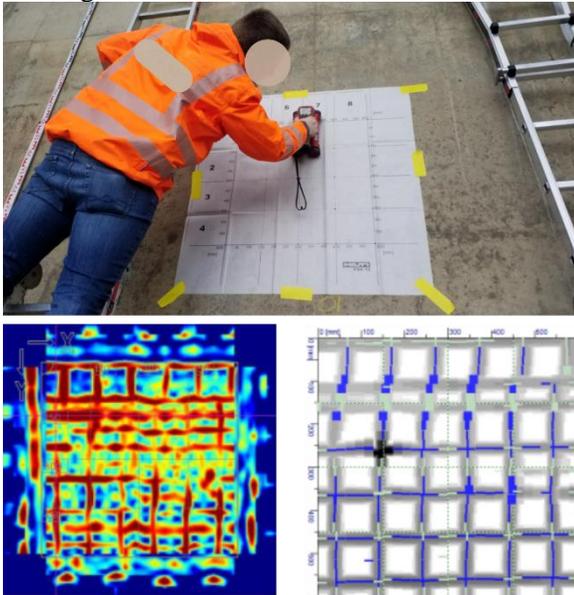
Non-destructive testing methods used for the reinforcement detection of a cantilever wall
